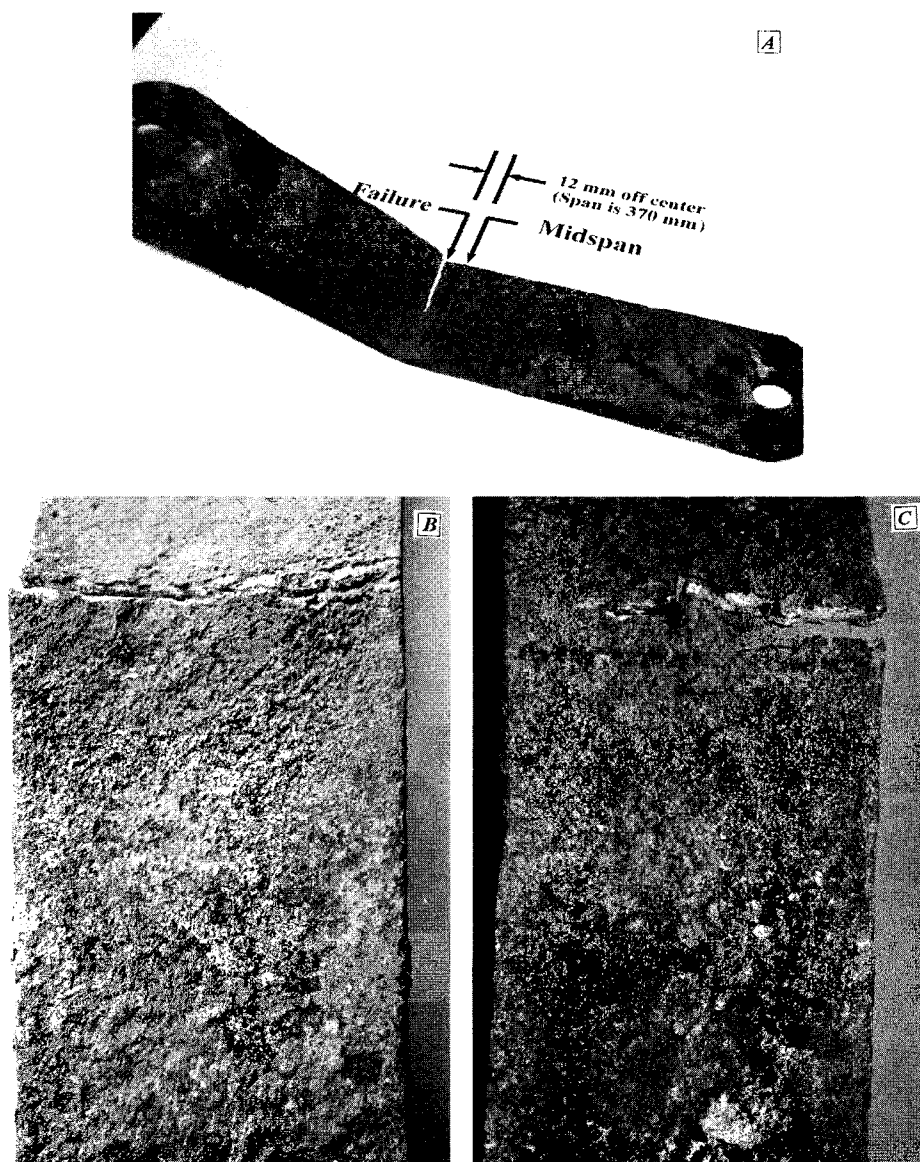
Final State of Plate Specimens and Cross-Width Cracks: (a) Global View of Specimen 1 after Test; (b) Cross-Width Cracking for Specimen 1; (c) Cross-Width Cracking for Specimen 2
